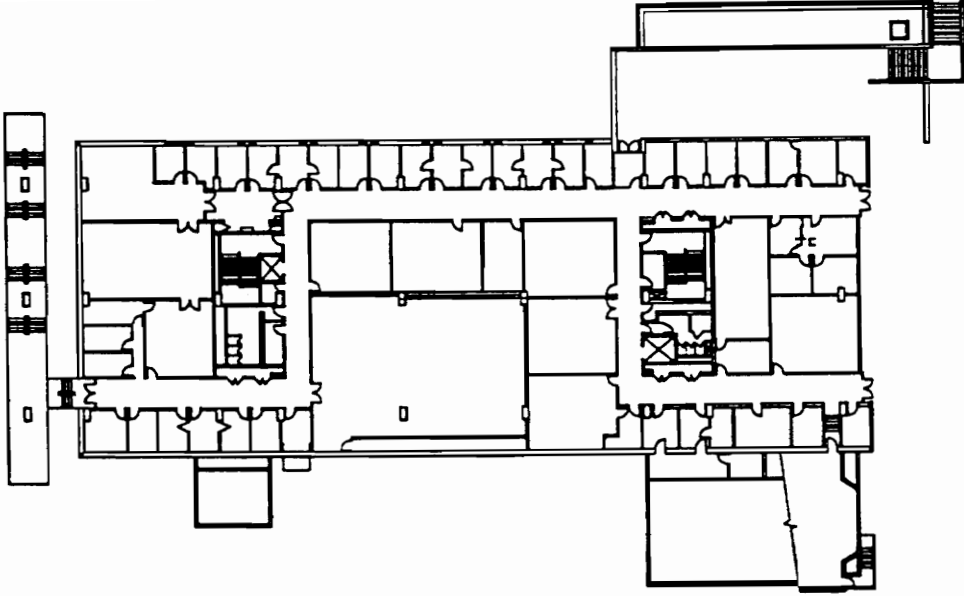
Example floor plan. This is one floor of Whittemore Hall on the Virginia Tech campus. This drawing was generated directly from an AutoCAD file provided by the university's Facilities Planning and Construction department.
